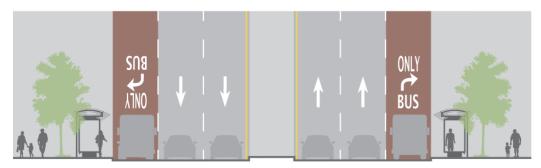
| Alternative 5 Cross-section of Spring Hill Road from International Drive to Route 7
